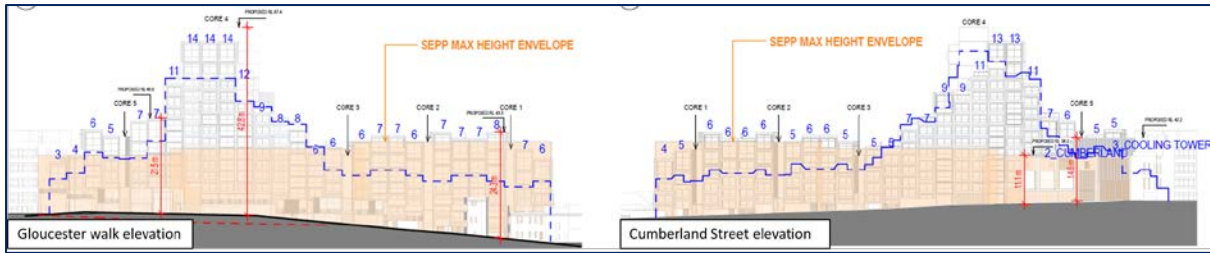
| SEPP height (orange), existing (blue line) and proposed building height (grey) (Source: EIS Appendix G, Architectural Plans)
